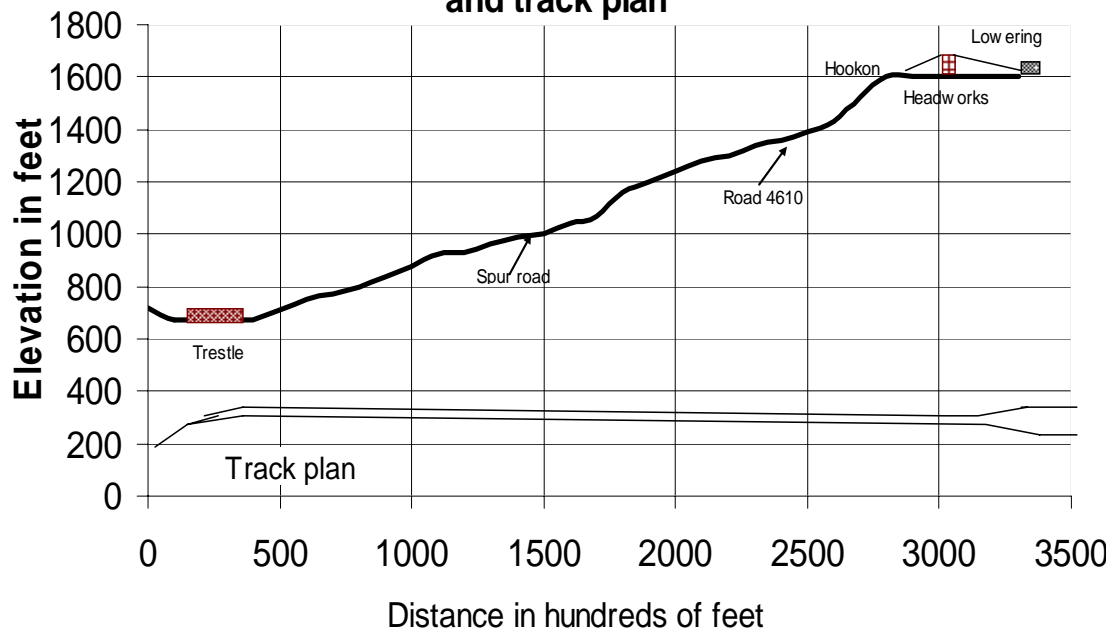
Plan of headworks, incline, and plan view of incline railroad tracks at Camp 1 (adapted from Miss et al. 2000).
